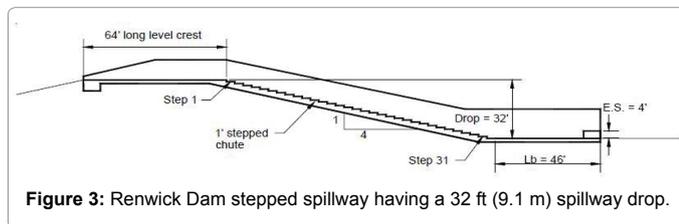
Renwick Dam stepped spillway having a 32 ft (9.1 m) spillway drop.
